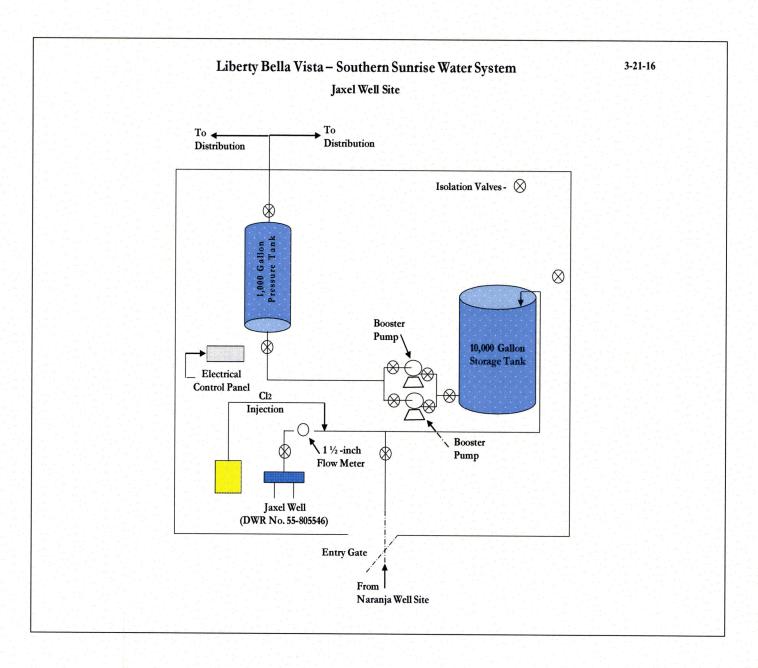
SOUTHERN SUNRISE WATER SYSTEM JAXEL WELL SITE
